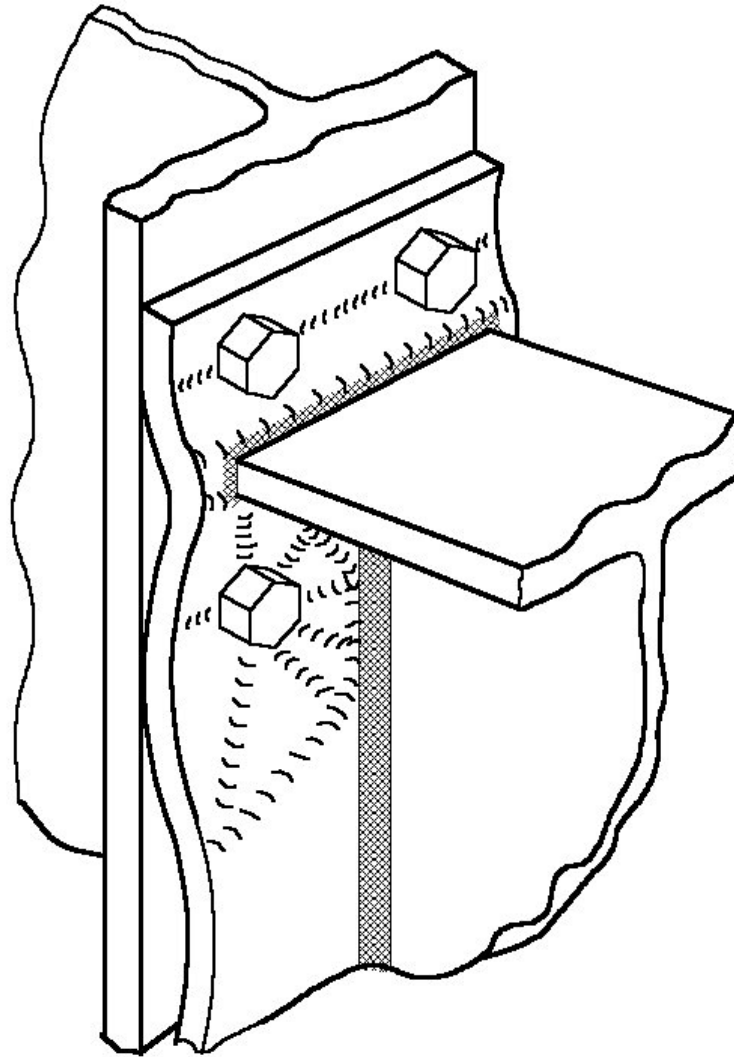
Controlled yielding of end plate protects brittle components (bolts & welds) from overloading
